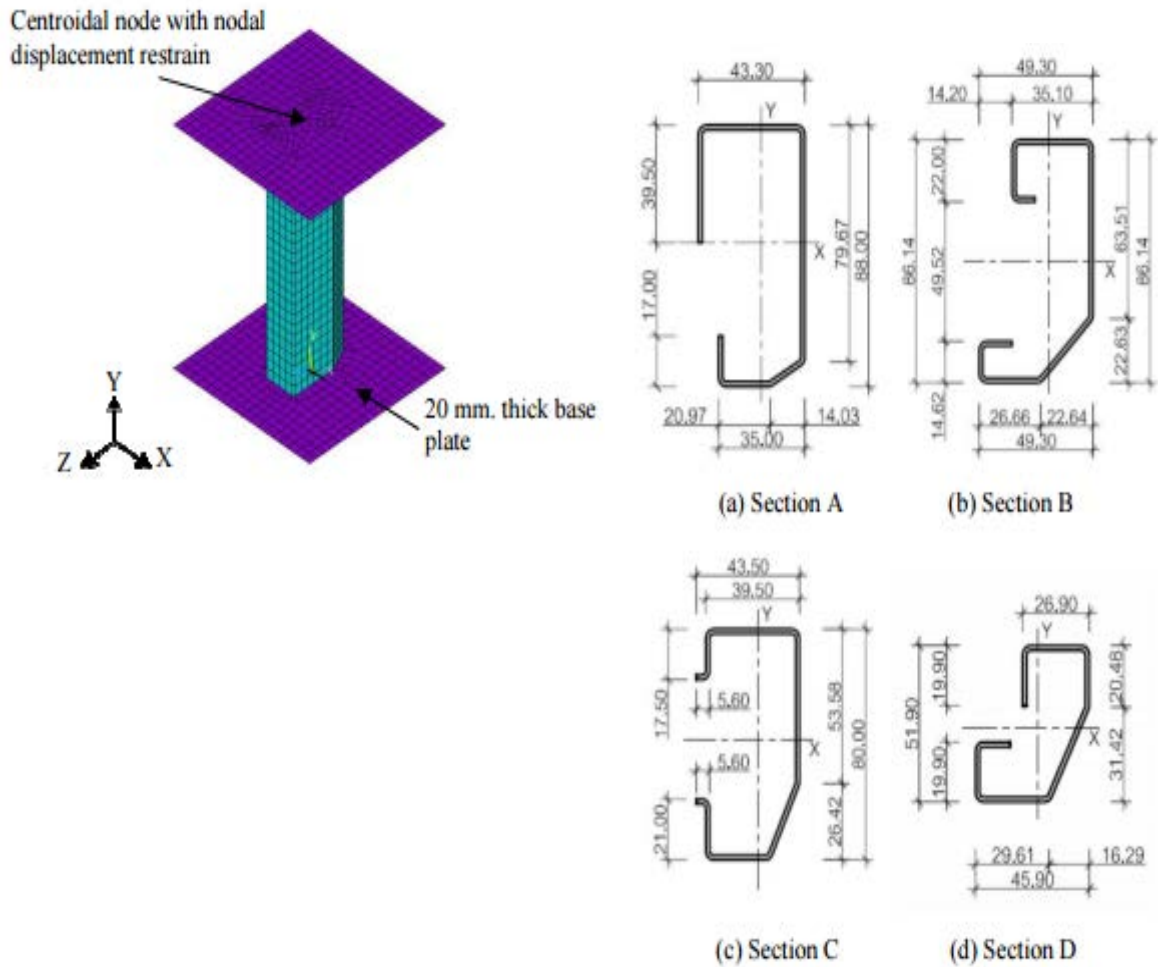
1) Finite element model. 2) column sections (unit: mm) (Hansapinyo, 2015).
